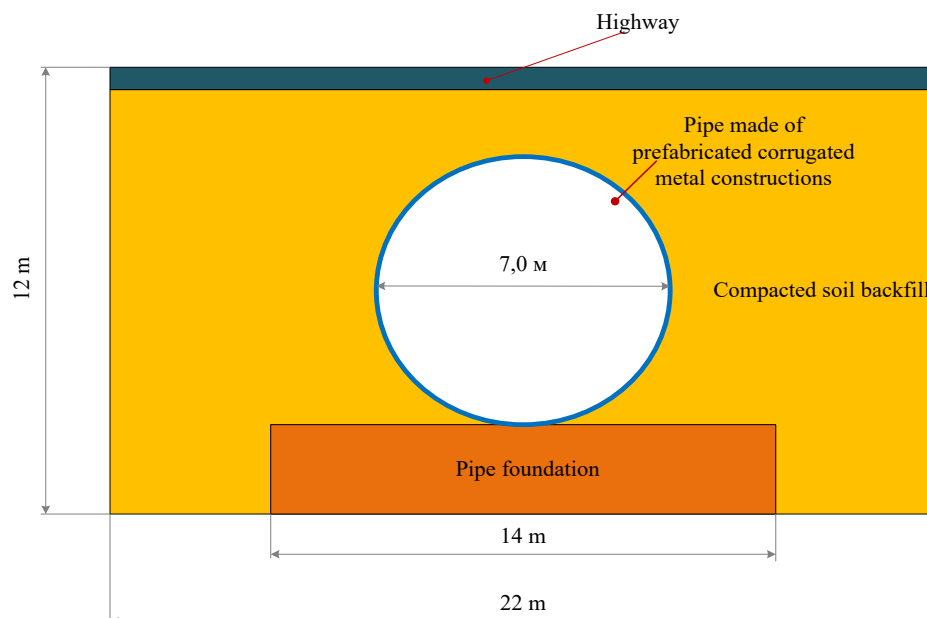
Geometric diagram of the pipe made of prefabricated corrugated metal constructions
